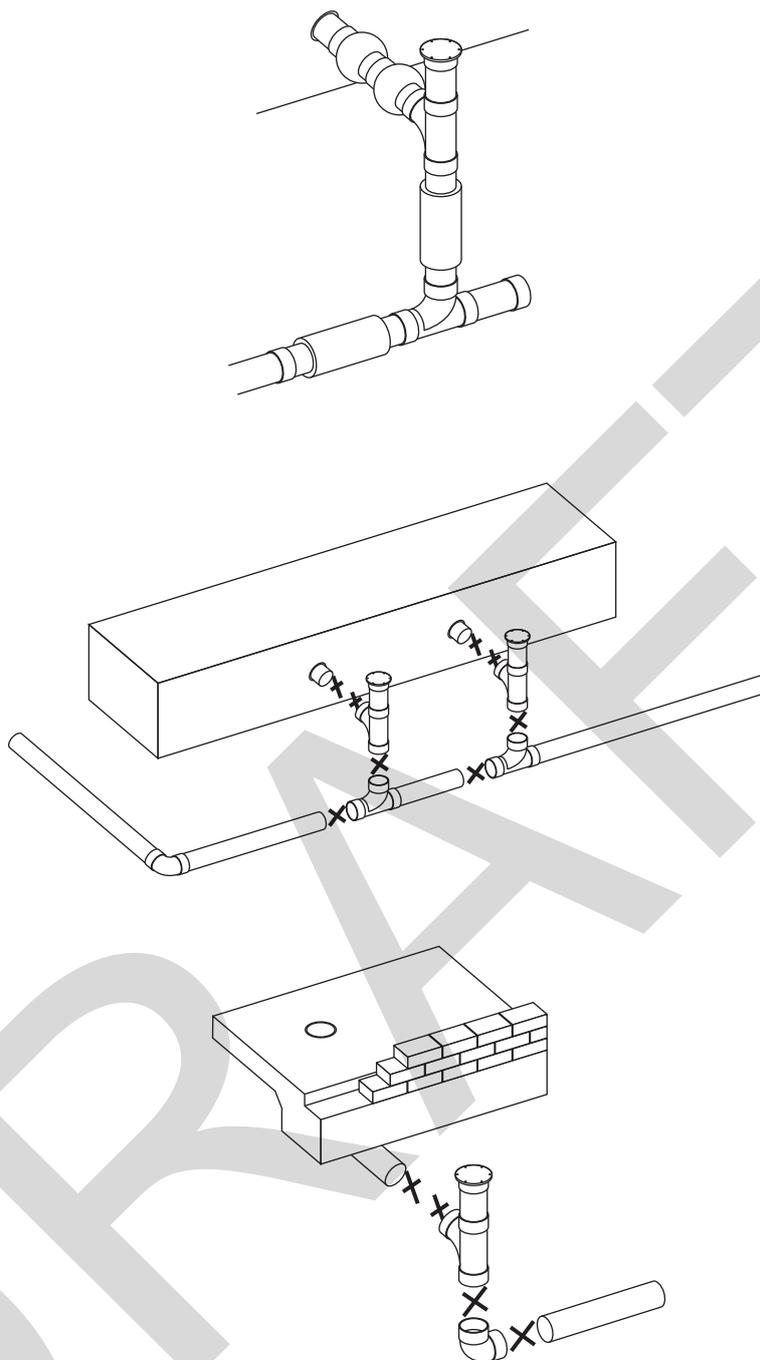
TYPICAL VERTICAL RISERS
